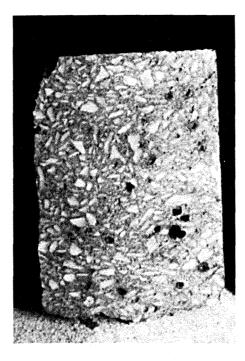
Section of 8-in.-wide beam treated for depth of carbonation
